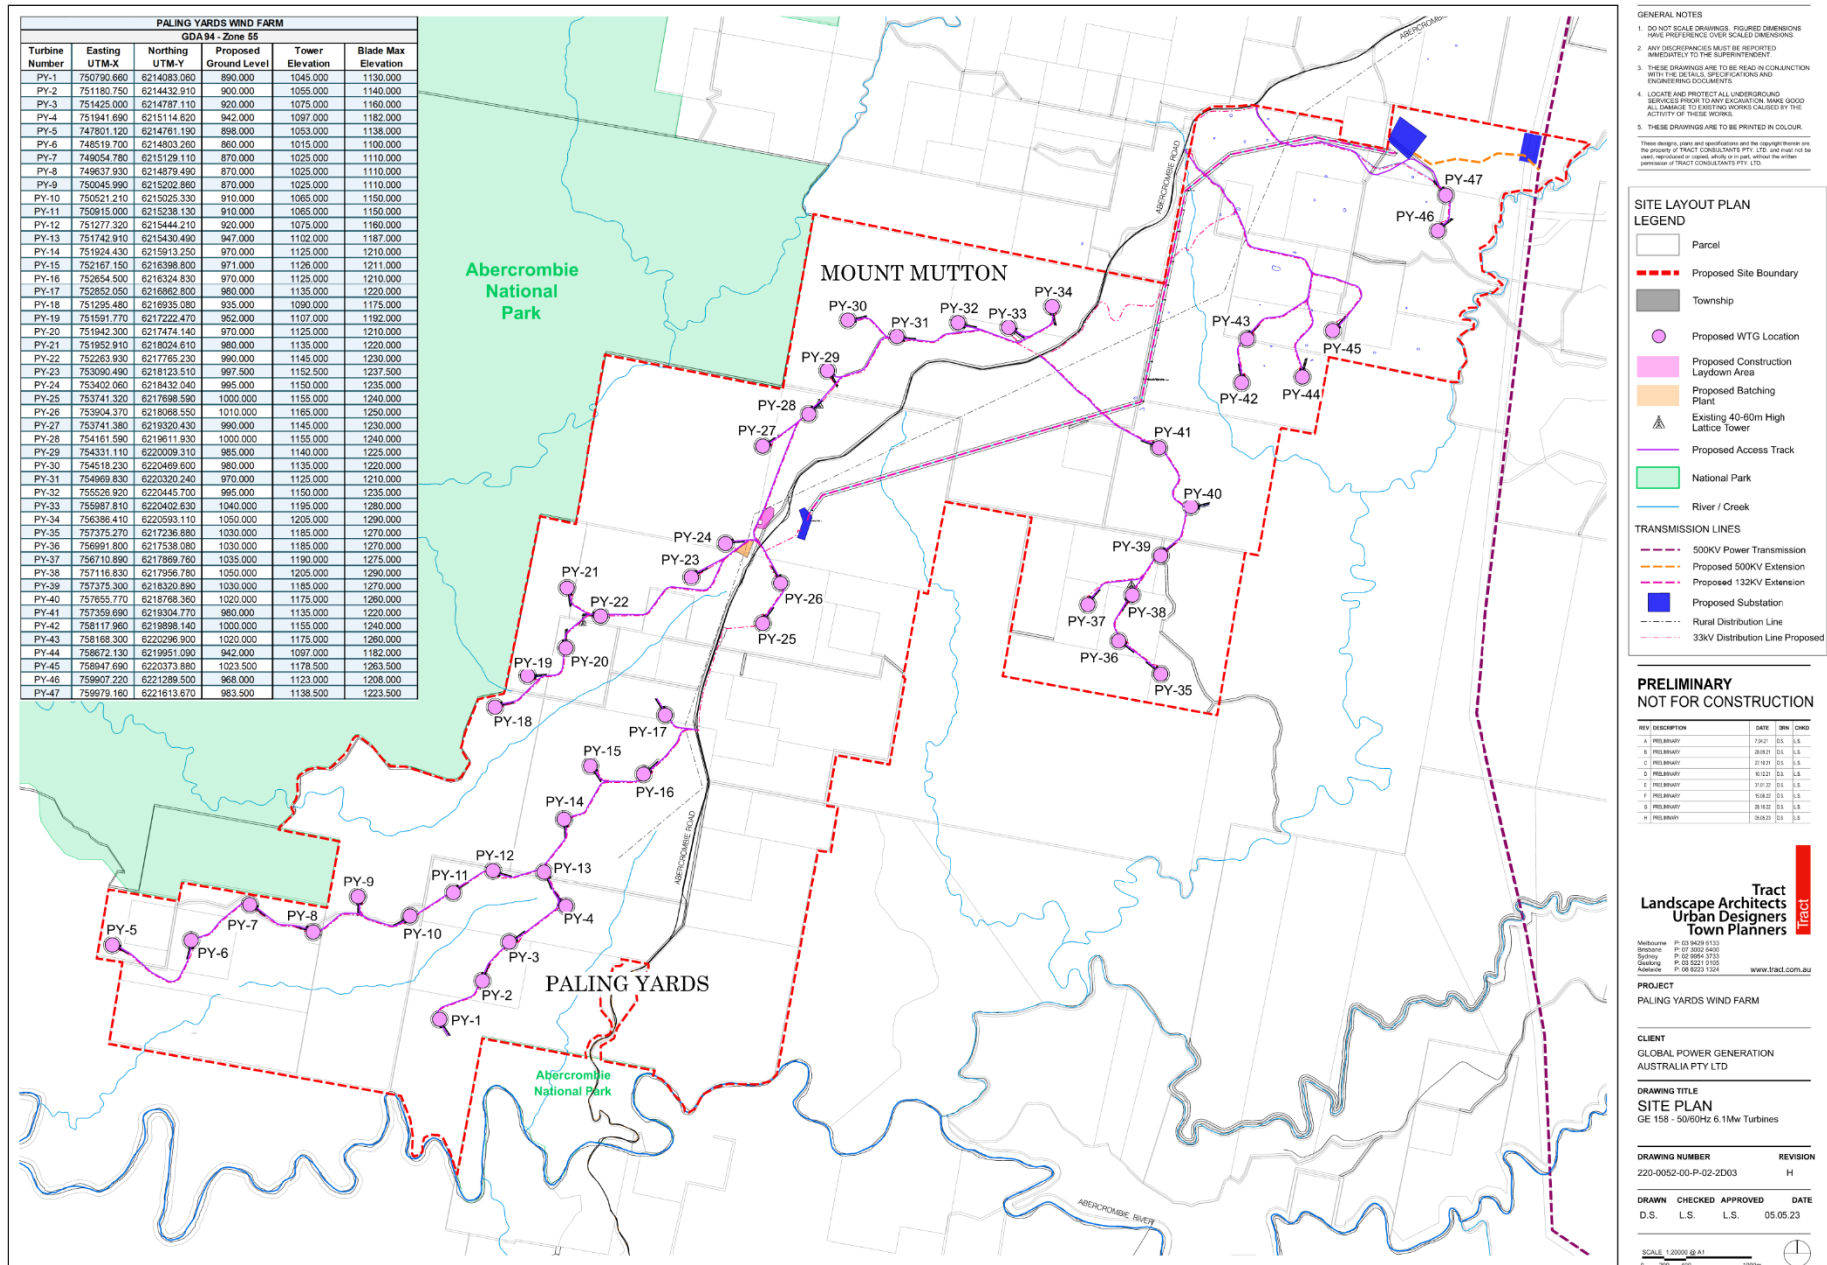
Site Plan Wind Turbine Location (Source: Tract 2023)
